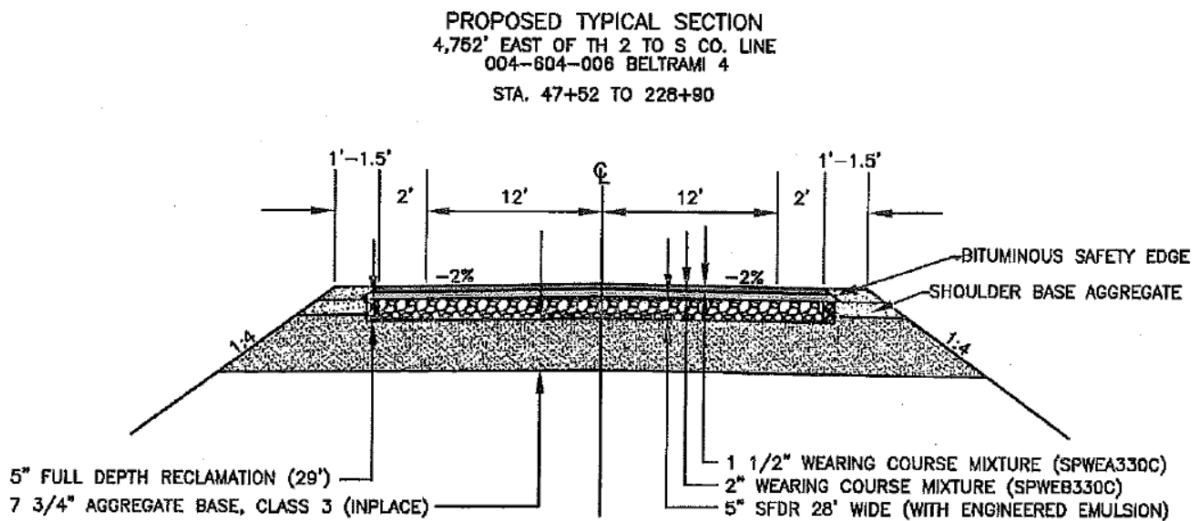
Beltrami CSAH 4 Proposed Typical Section
